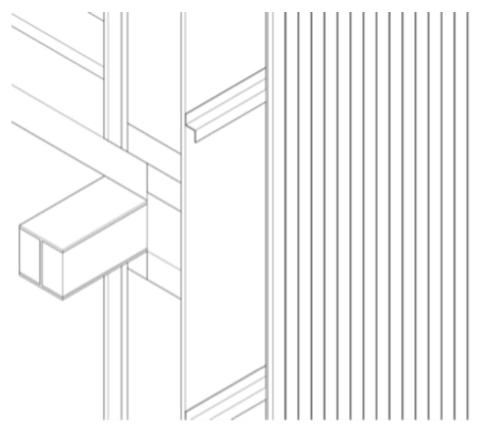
PROPOSED CONNECTION DETAIL FOR THE STEEL STRUCTURE WITH CONCRETE SLAB AND WITH WOODEN FAÇADE. @ZHAW
